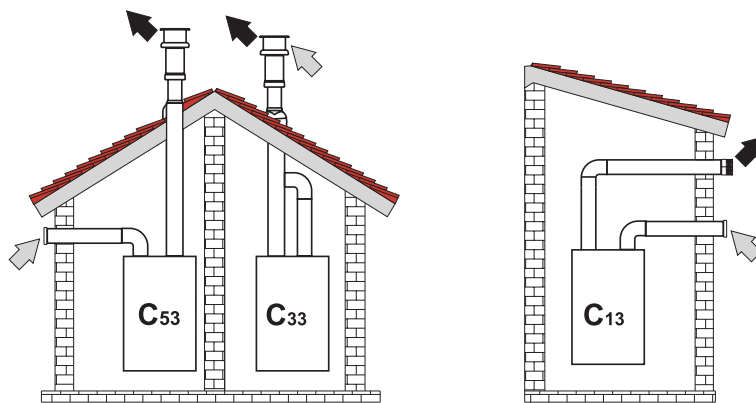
Examples of connection with separate pipes (⇨ = Air / ⇨ = Fumes)
